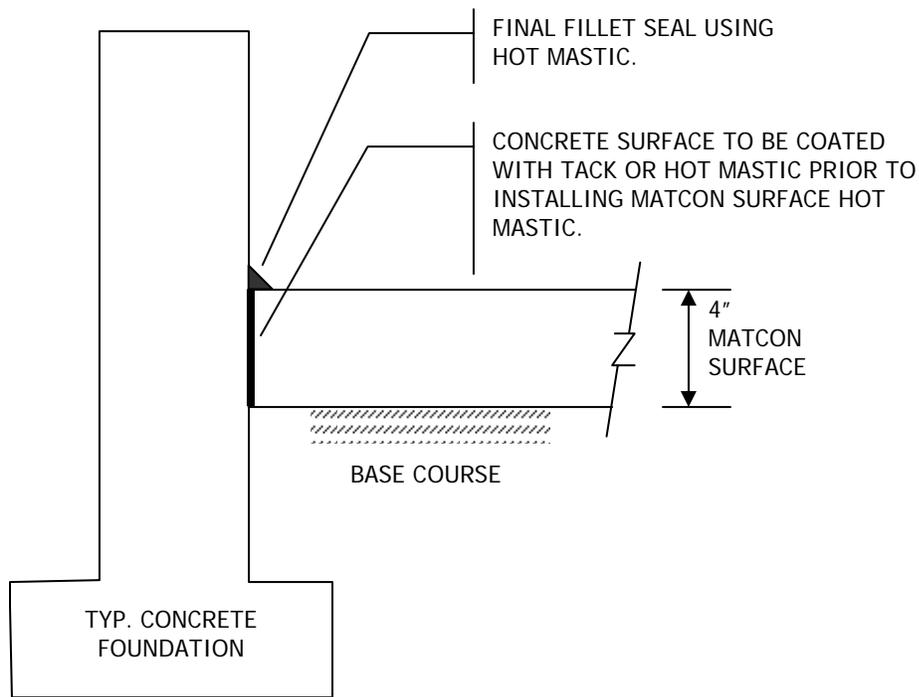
A: SEALING THE EDGE OF A MATCON SURFACE PLACED AGAINST AN EXISTING CONCRETE STRUCTURE. CONCRETE SHOULD BE DRY AND CLEAN BEFORE APPLYING TACK OR MASTIC. COMPACTION EQUIPMENT SHOULD “PINCH” HOT MATCON MATERIAL AGAINST THE CONCRETE STRUCTURE AS TIGHT AS CONDITIONS WILL ALLOW. THE FINAL SEAL SHOULD BE A “FILLET” OF MASTIC IN THE CORNER OF THE INTERSECTION AS SHOWN.
